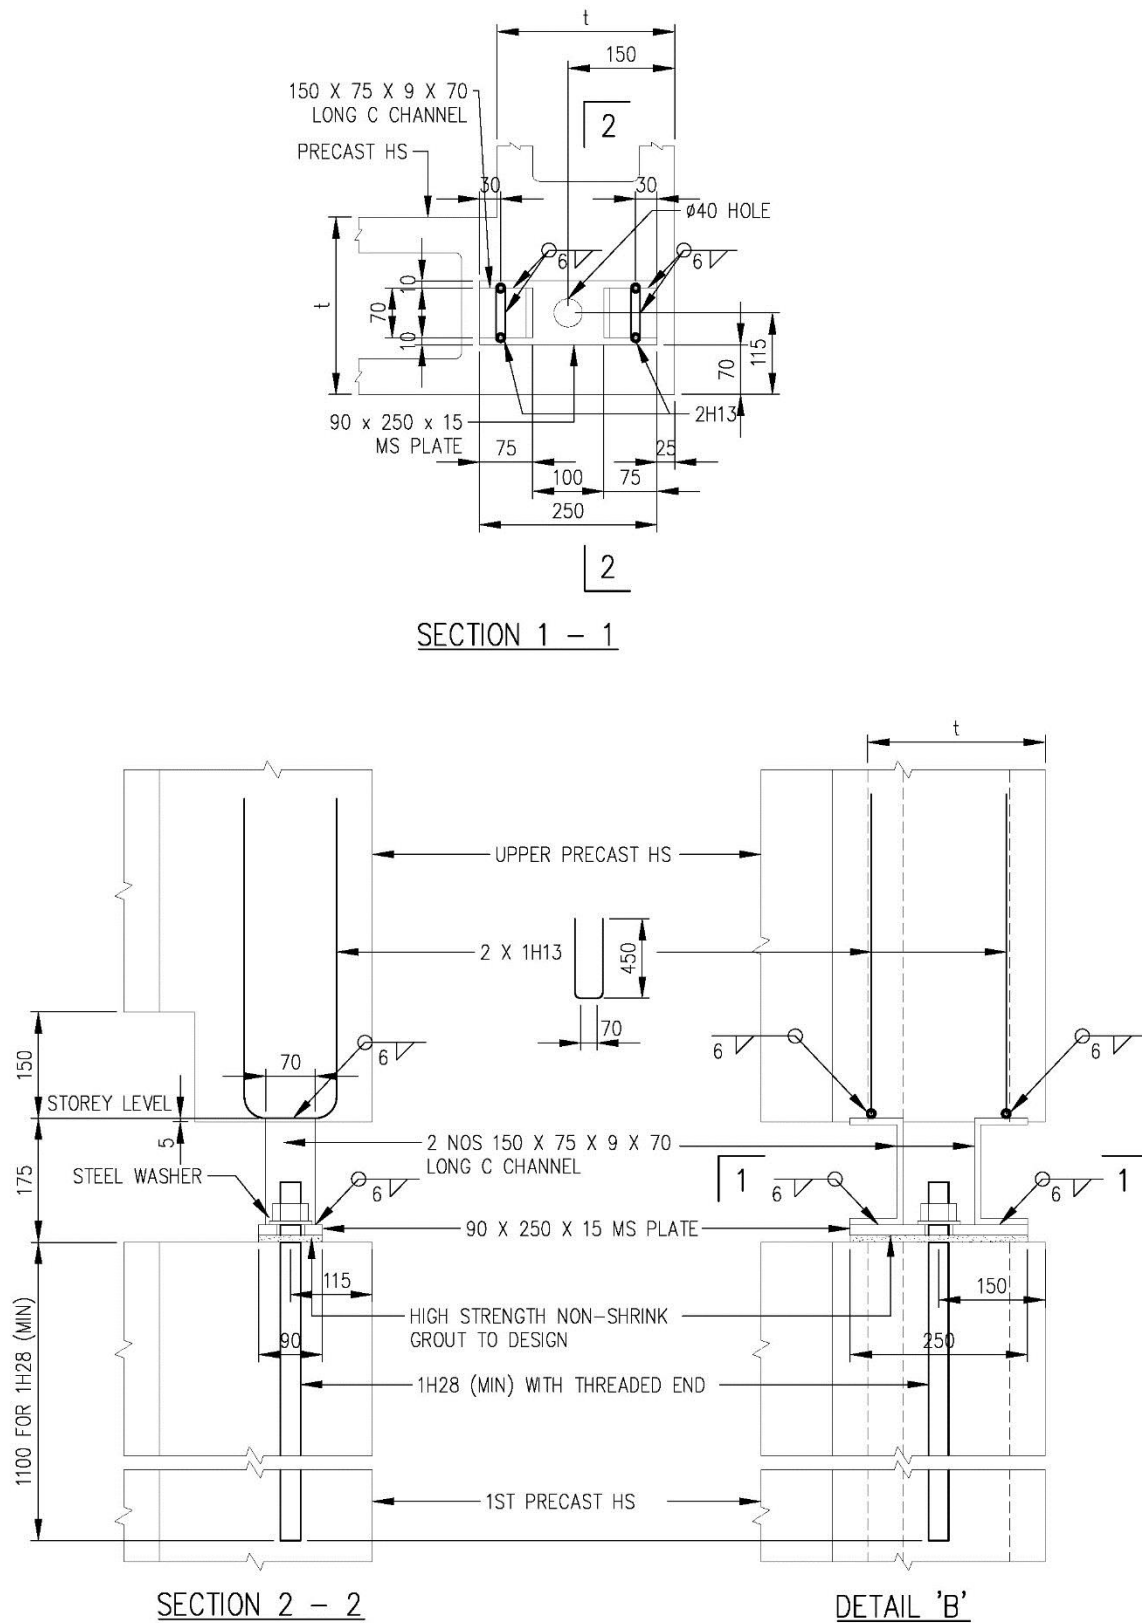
CONNECTION DETAILS BETWEEN LOWER AND UPPER PRECAST HS (DETAIL 'B')
